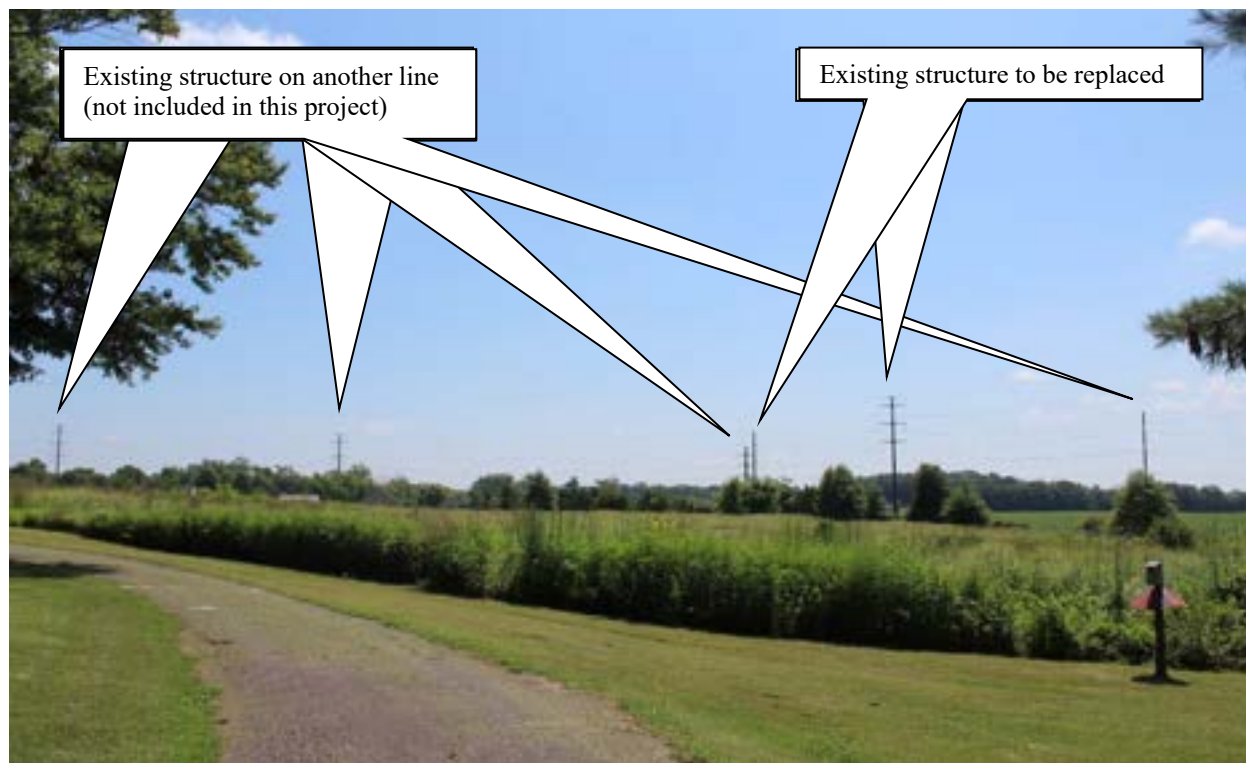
Photo location 6- View from Rose Hill Farm (Multiple existing project structures and structures on another line visible), facing southeast.
